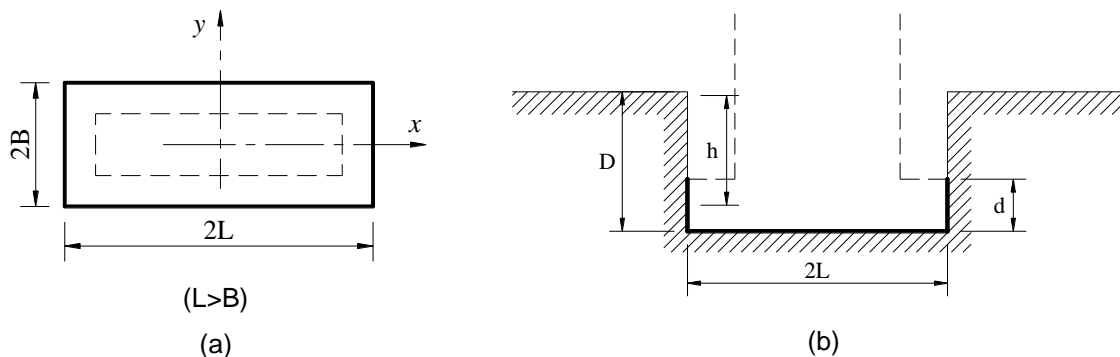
Geometric configuration of a foundation in plan (a) and cross section (b) view.
